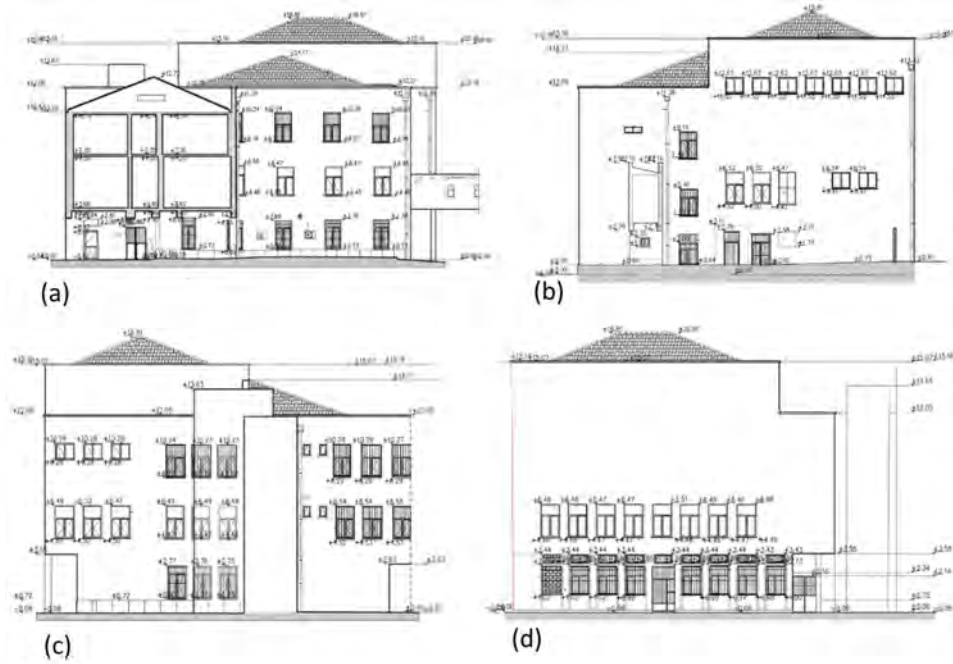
Façade views of the examined building. (a) South, (b) East, (c) West, (d) North
